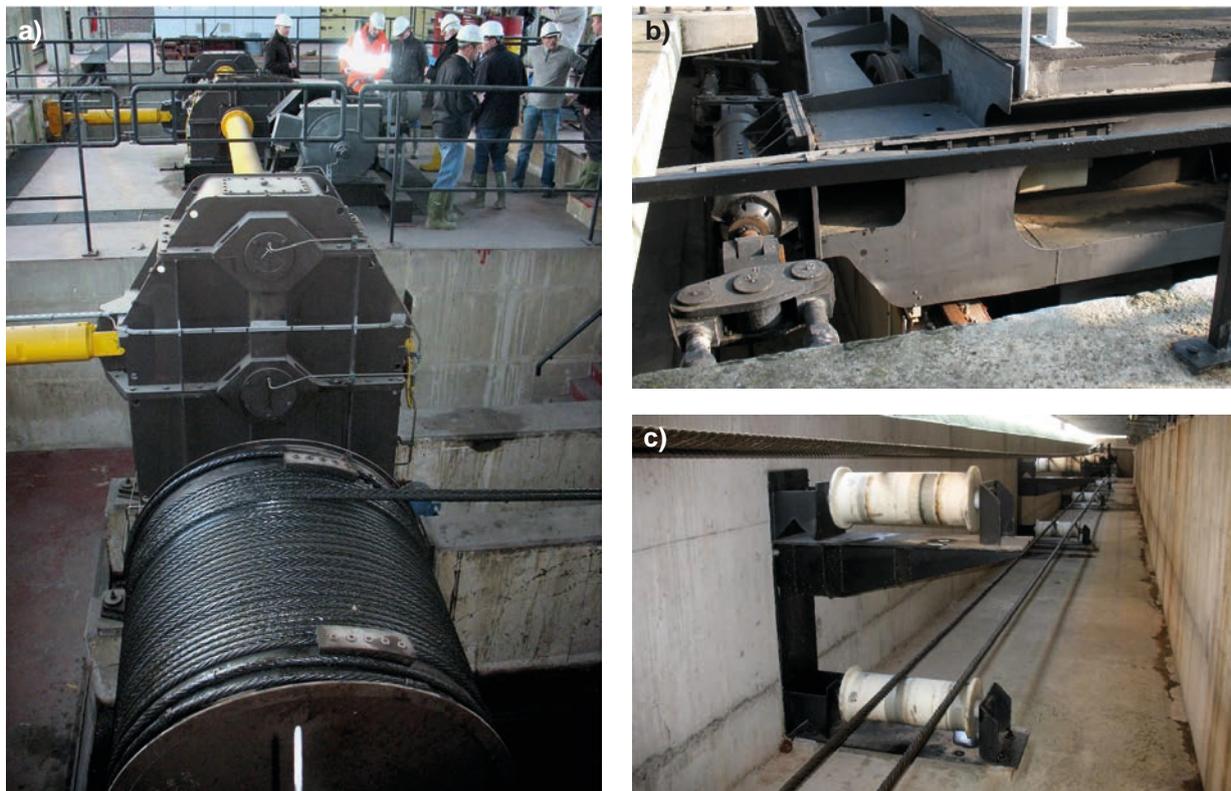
Typical drives of Belgian rolling gates, details: a) winch drums, gears and engine units, b) rope coupling to the upper carriage, c) wire rope rollers, photos R. Daniel
